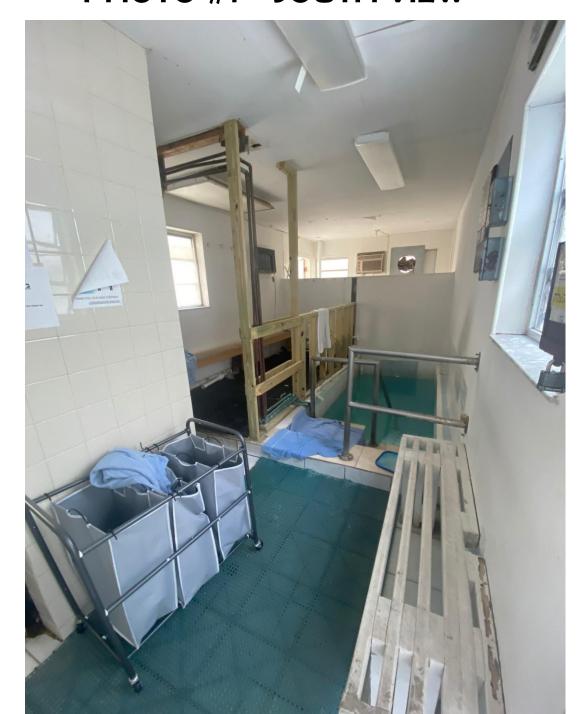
= BACK STRUCTURE RITUAL BATH
